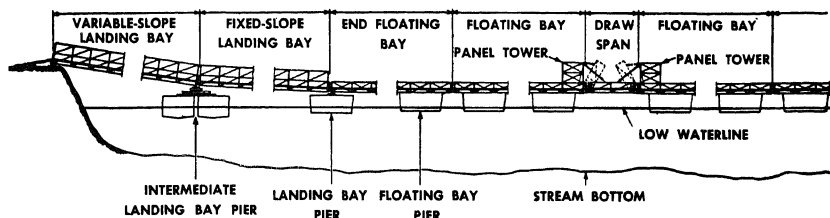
Nomenclature of panel bridge on barges. Steep bank (no ground piers).
